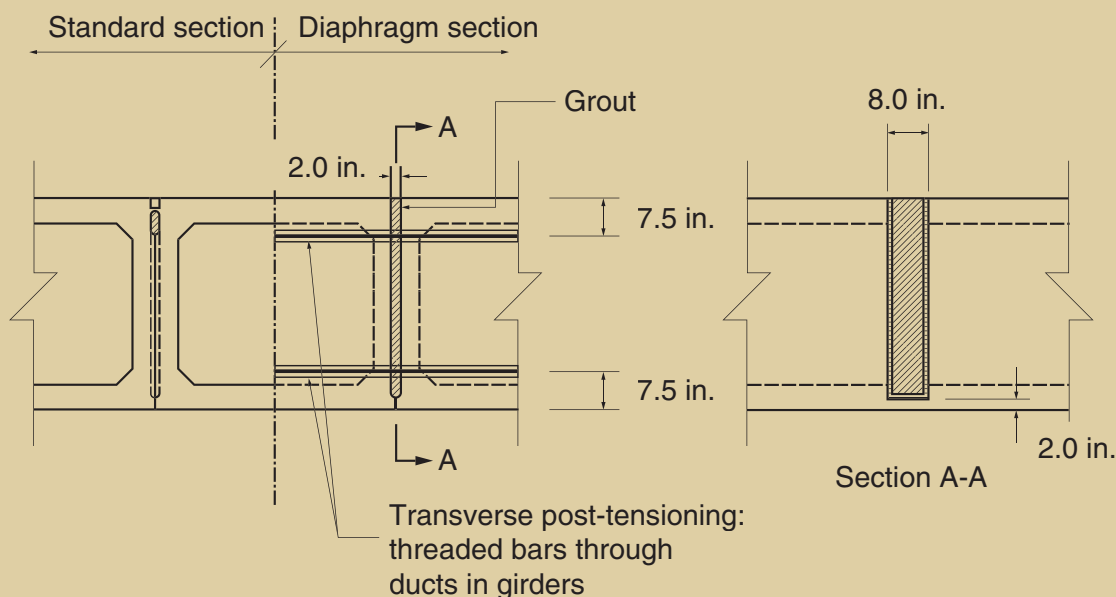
The transverse diaphragms are made continuous across the entire width of the bridge using grouted full-depth shear keys and post-tensioning tendons. Source: Figure 8.9.3-1. PCI Bridge Design Manual Steering Committee, *Precast Prestressed Concrete Bridge Design Manual* (Chicago, IL: PCI, 2003). Note: 1 in. = 25.4 mm.
